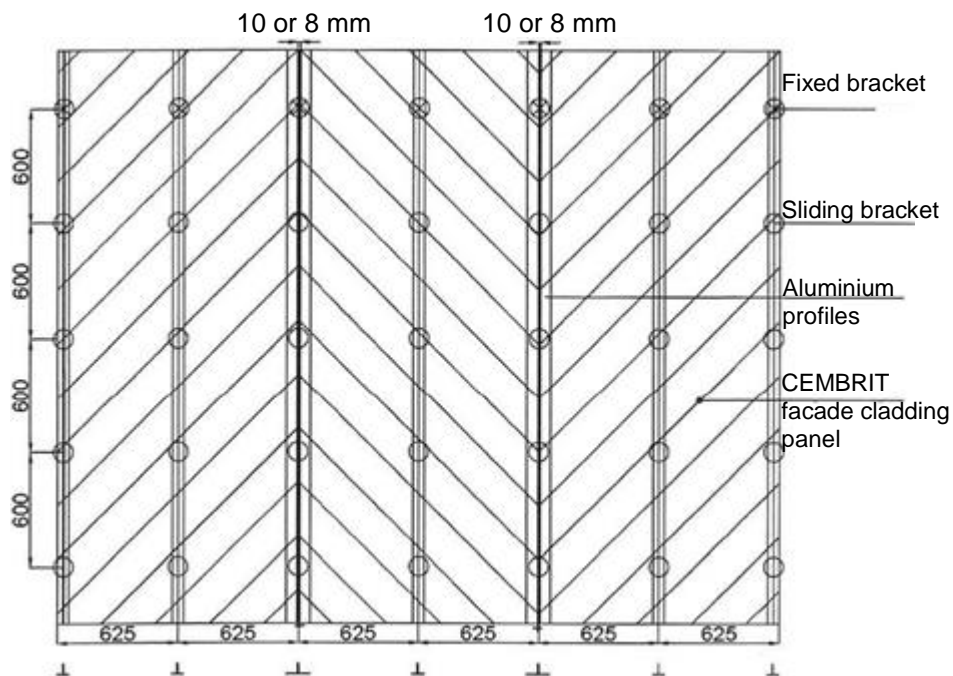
Facade cladding made using CEMBRIT system — example (Dimensions specified in mm)
